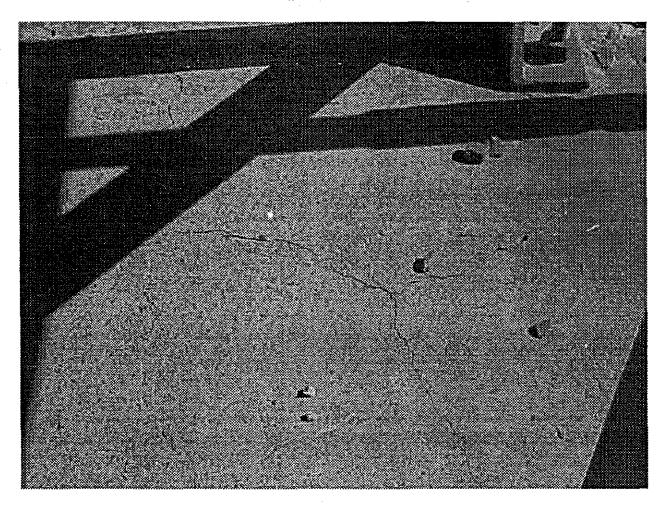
Typical cracking for Concrete Condition 'C'.
